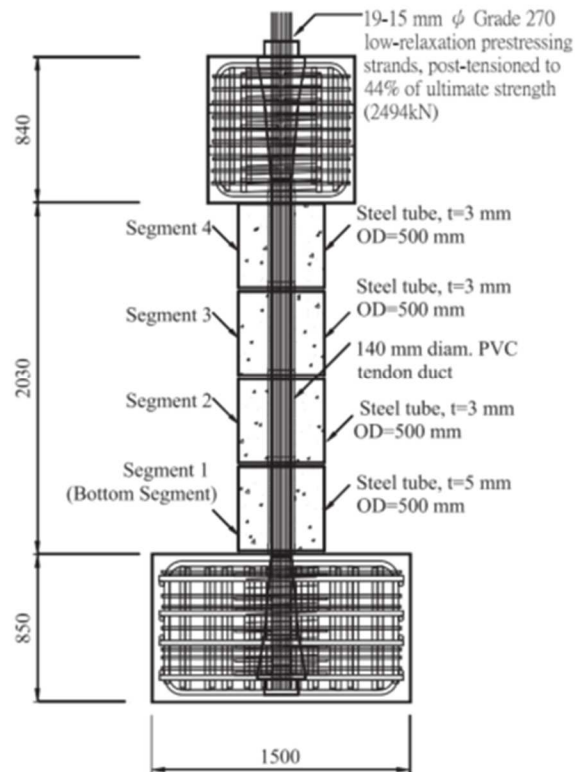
Post-tensioned, precast concrete-filled tube (CFT) segmental bridge columns (Reprinted from Chou and Chen 2006).
